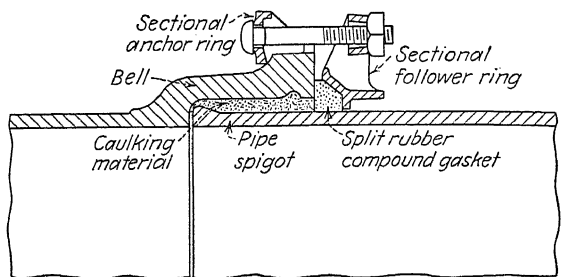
Leak clamp for repairing defective bell joints in gas and water mains and other services. (Courtesy of Dresser Manufacturing Company.)
